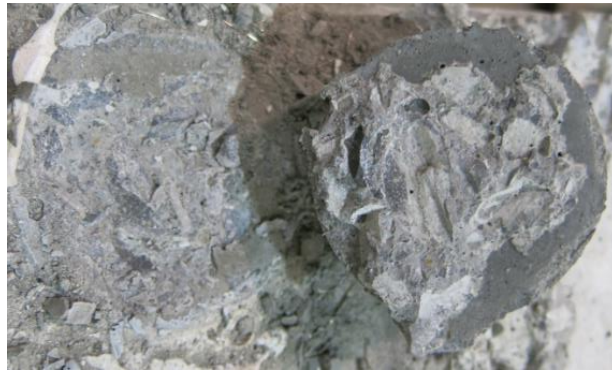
Picture showing a pull off specimen that pulled concrete off with it
